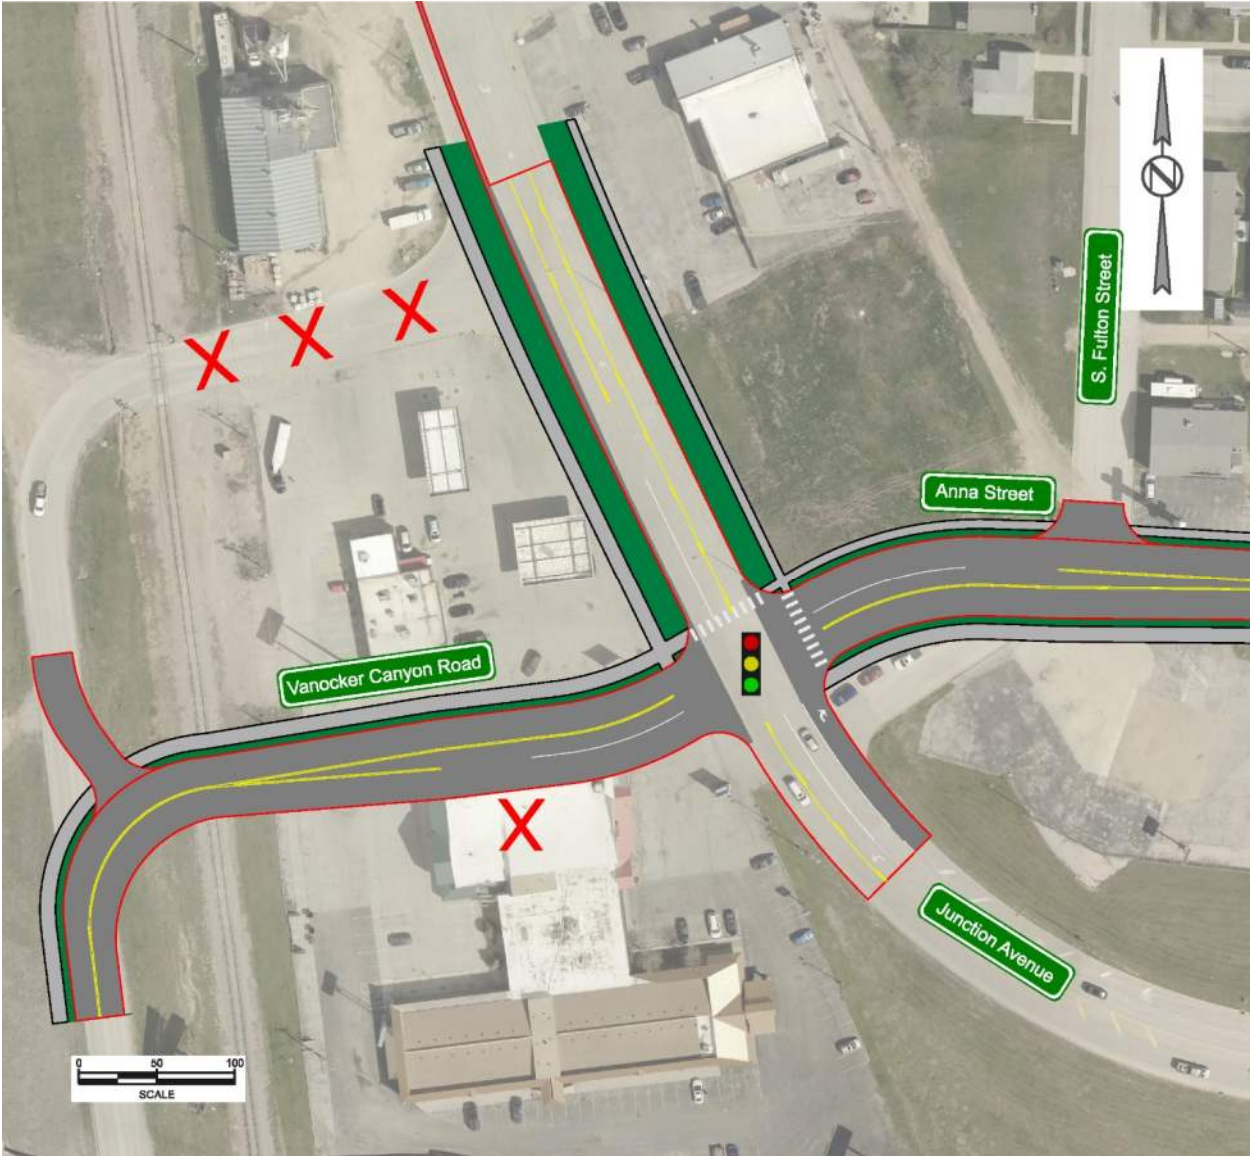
Realignment of Vanocker Canyon Road to Anna Street (Signal)
